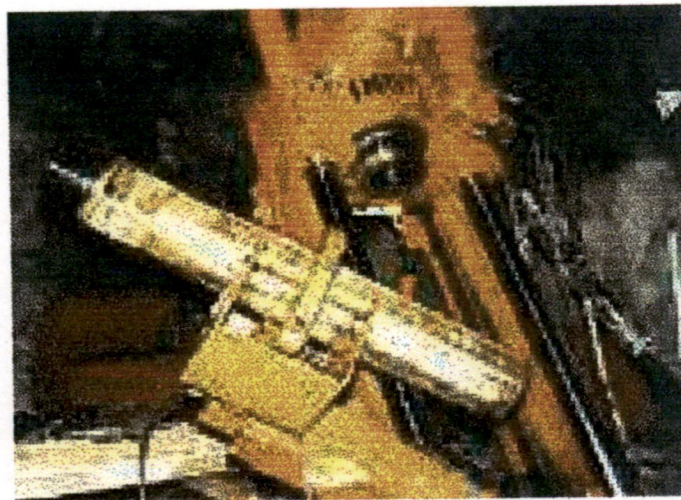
Raiser 90-H drilling 2.1m/150m shaft. (28)
